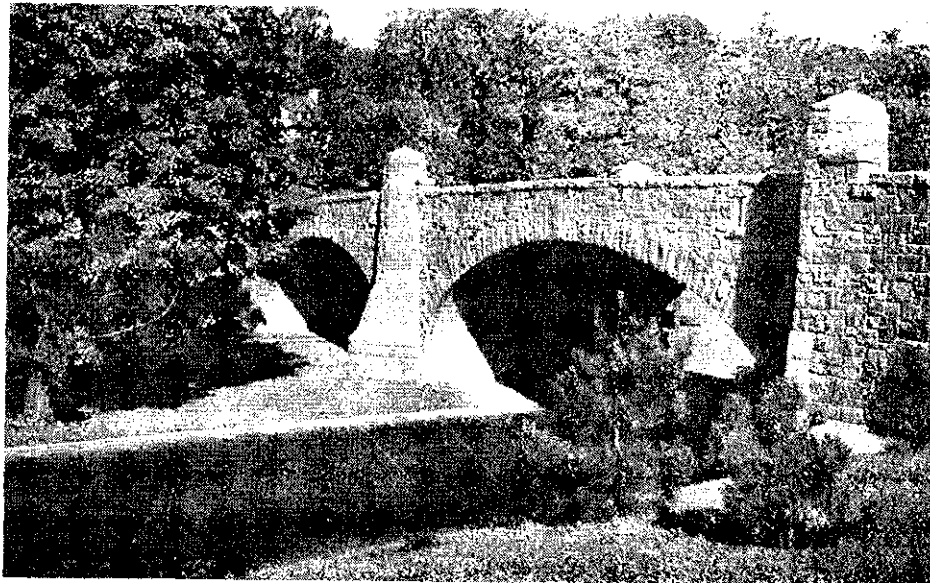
Classic stone-faced, rigid-frame concrete-arch parkway underpass and landscape setting, Mount Vernon, N.Y. (Westchester County Park Commission)
